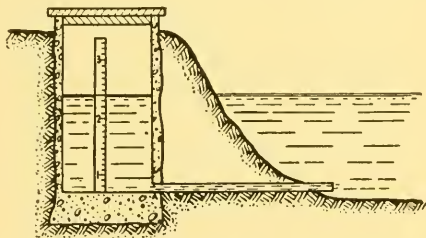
Illustrating the location and arrangement of a stilling box.
